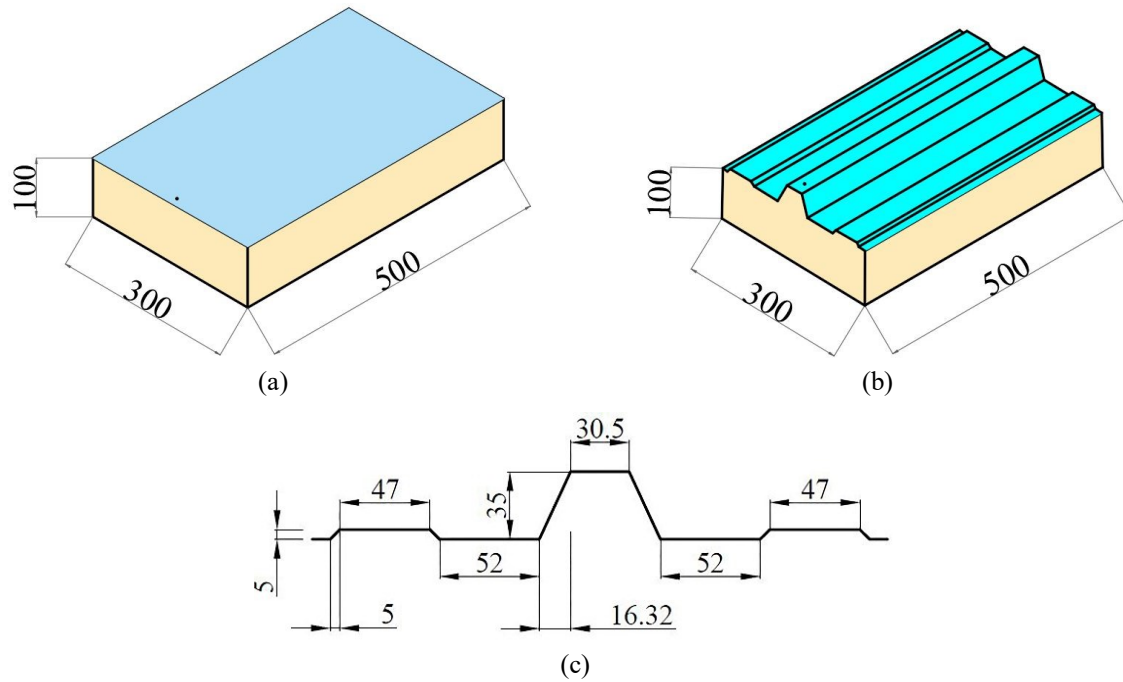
The cross-section of sandwich panels in translational tests, a) MW panels, b) PIR panels, c) trapezoidal sheeting, dimensions in mm
